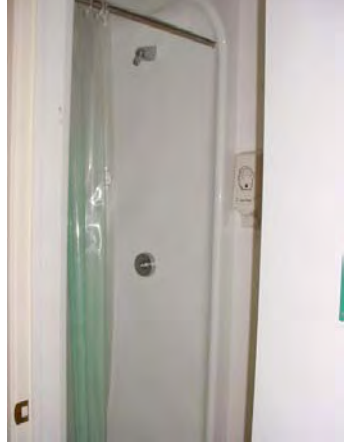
Typical 2<sup>nd</sup> floor shower stall.
